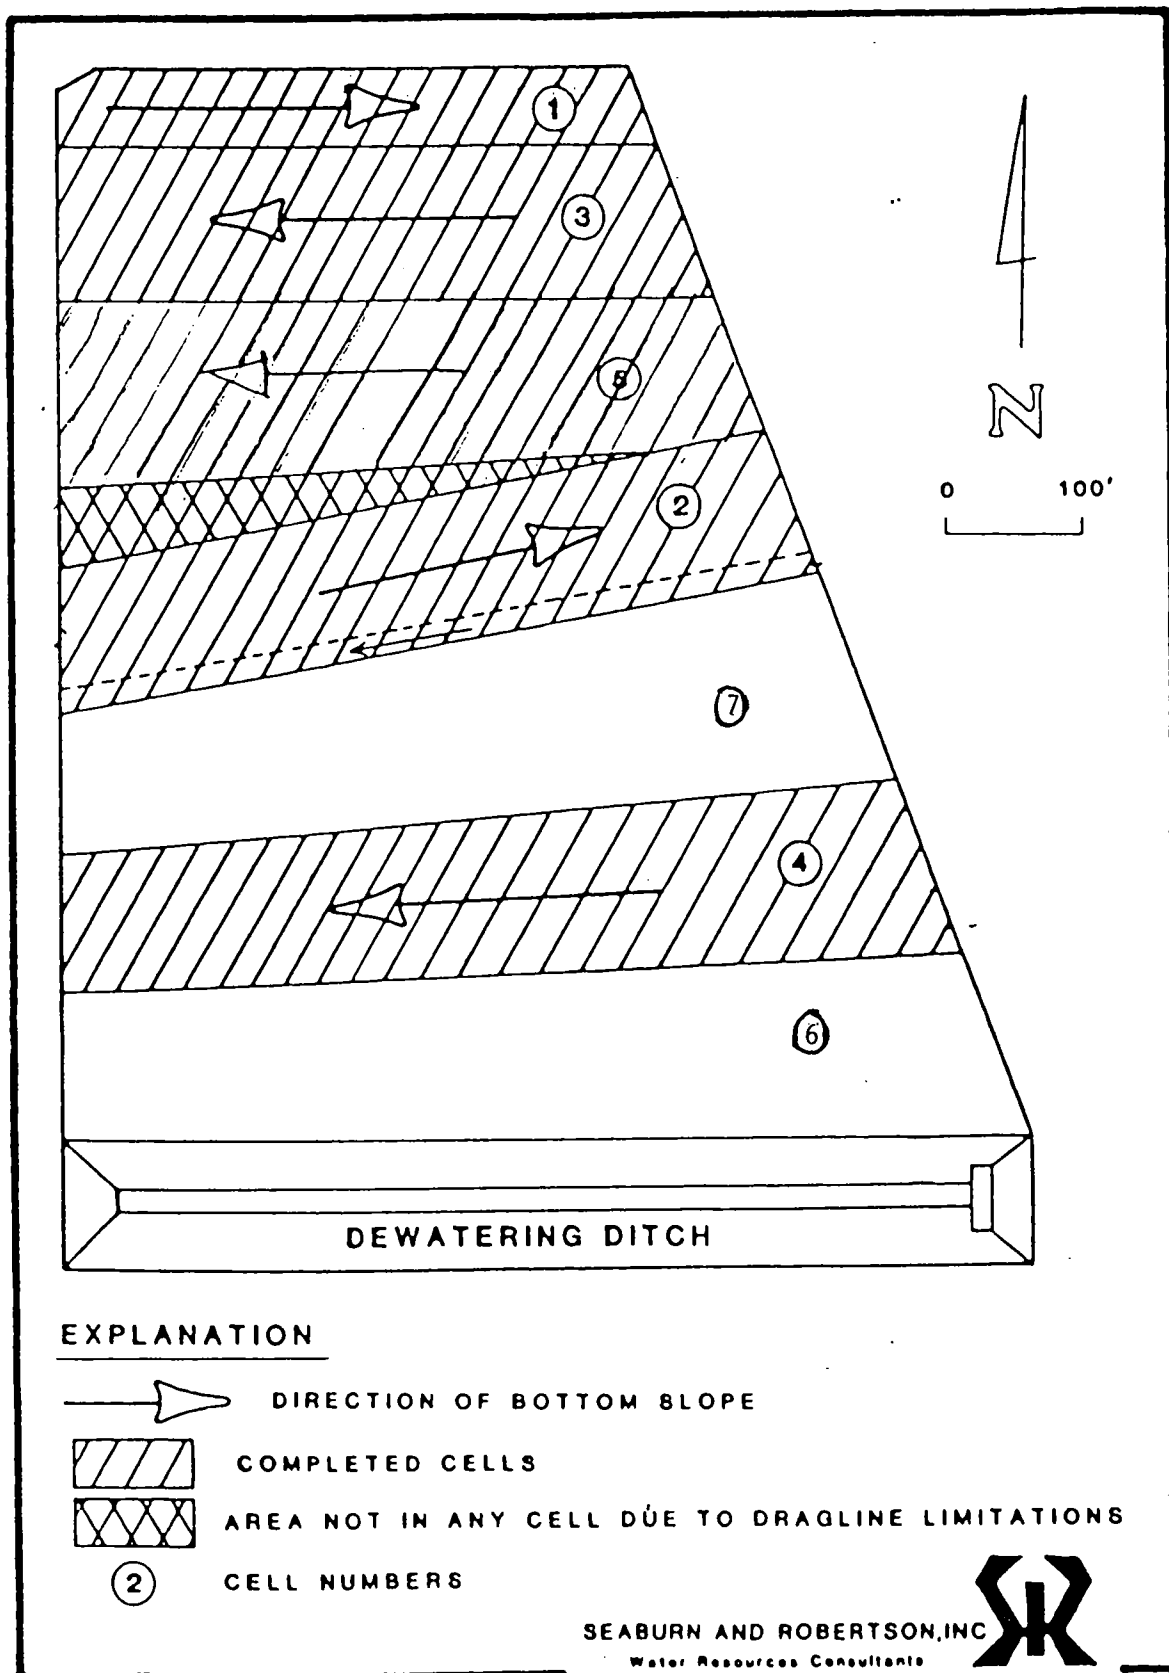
SITE PLAN FOR HARDEE COUNTY LANDFILL - PHASE 1
